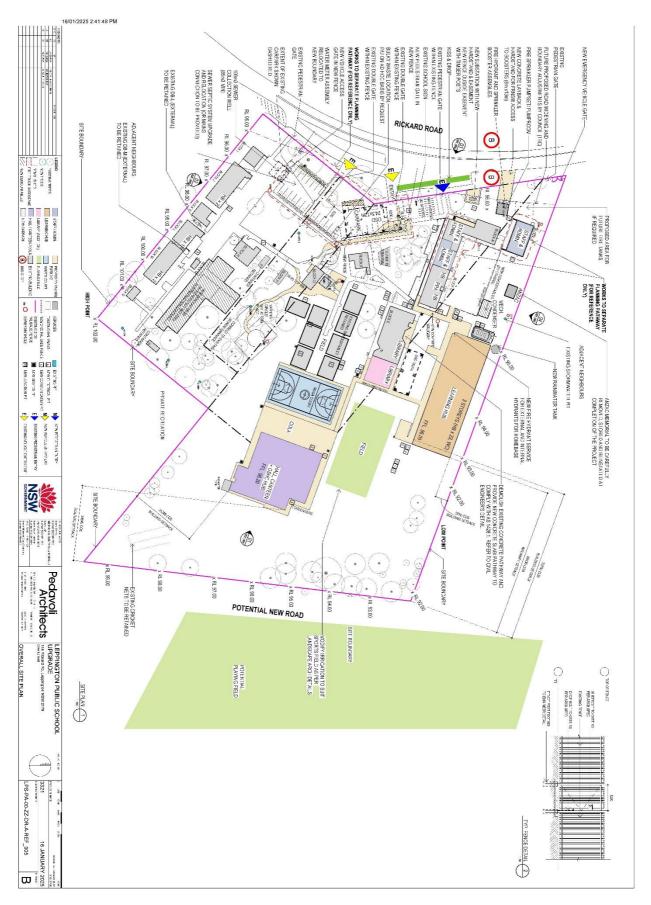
Proposed Activity (Source: Pedavoli Architects, Overall Site Plan (Rev B))
